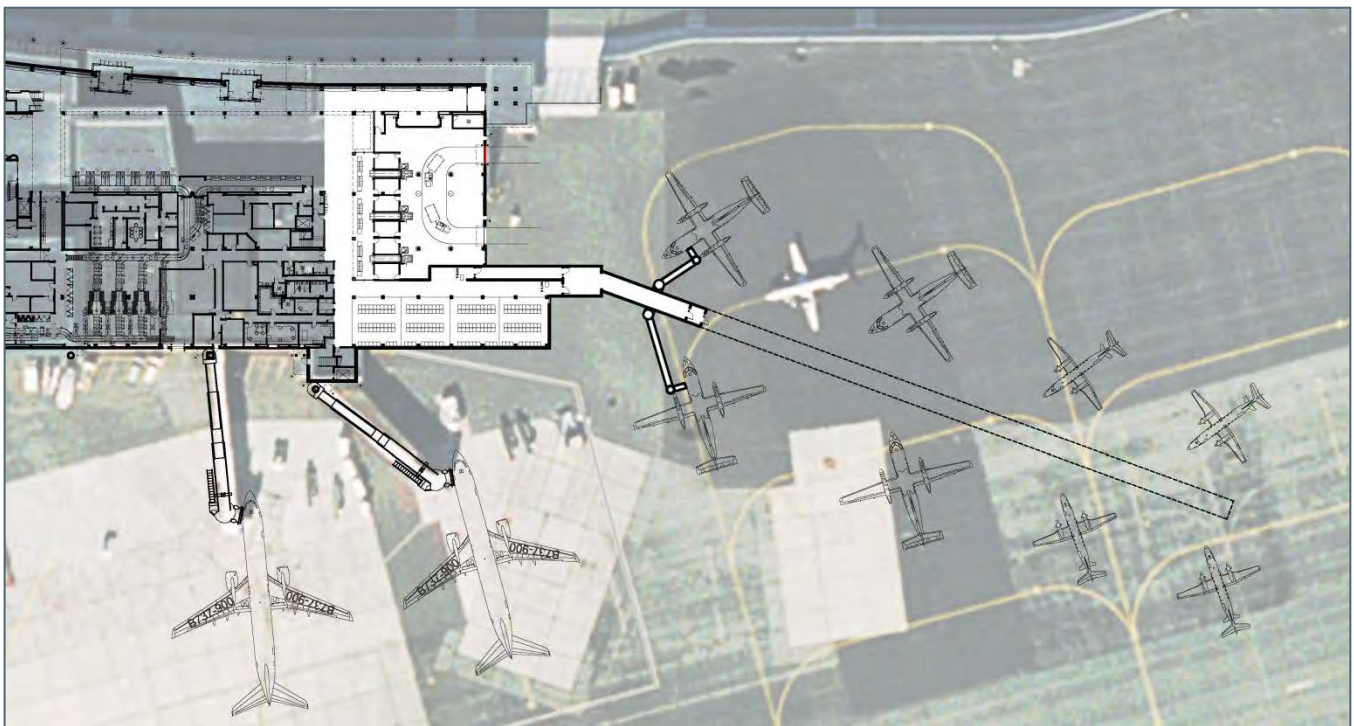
Option AP-4A –Ground-Loading Passenger Bridges with Incremental Extension of Enclosed Walkway, with Pull-In/Push-Back Aircraft Parking at PLB Positions
